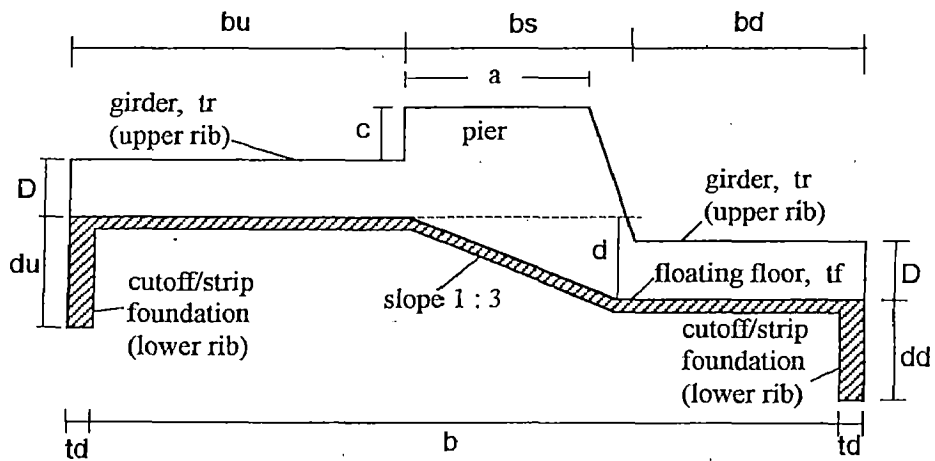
Barrage with Floating Floor and Ribbed Foundation
